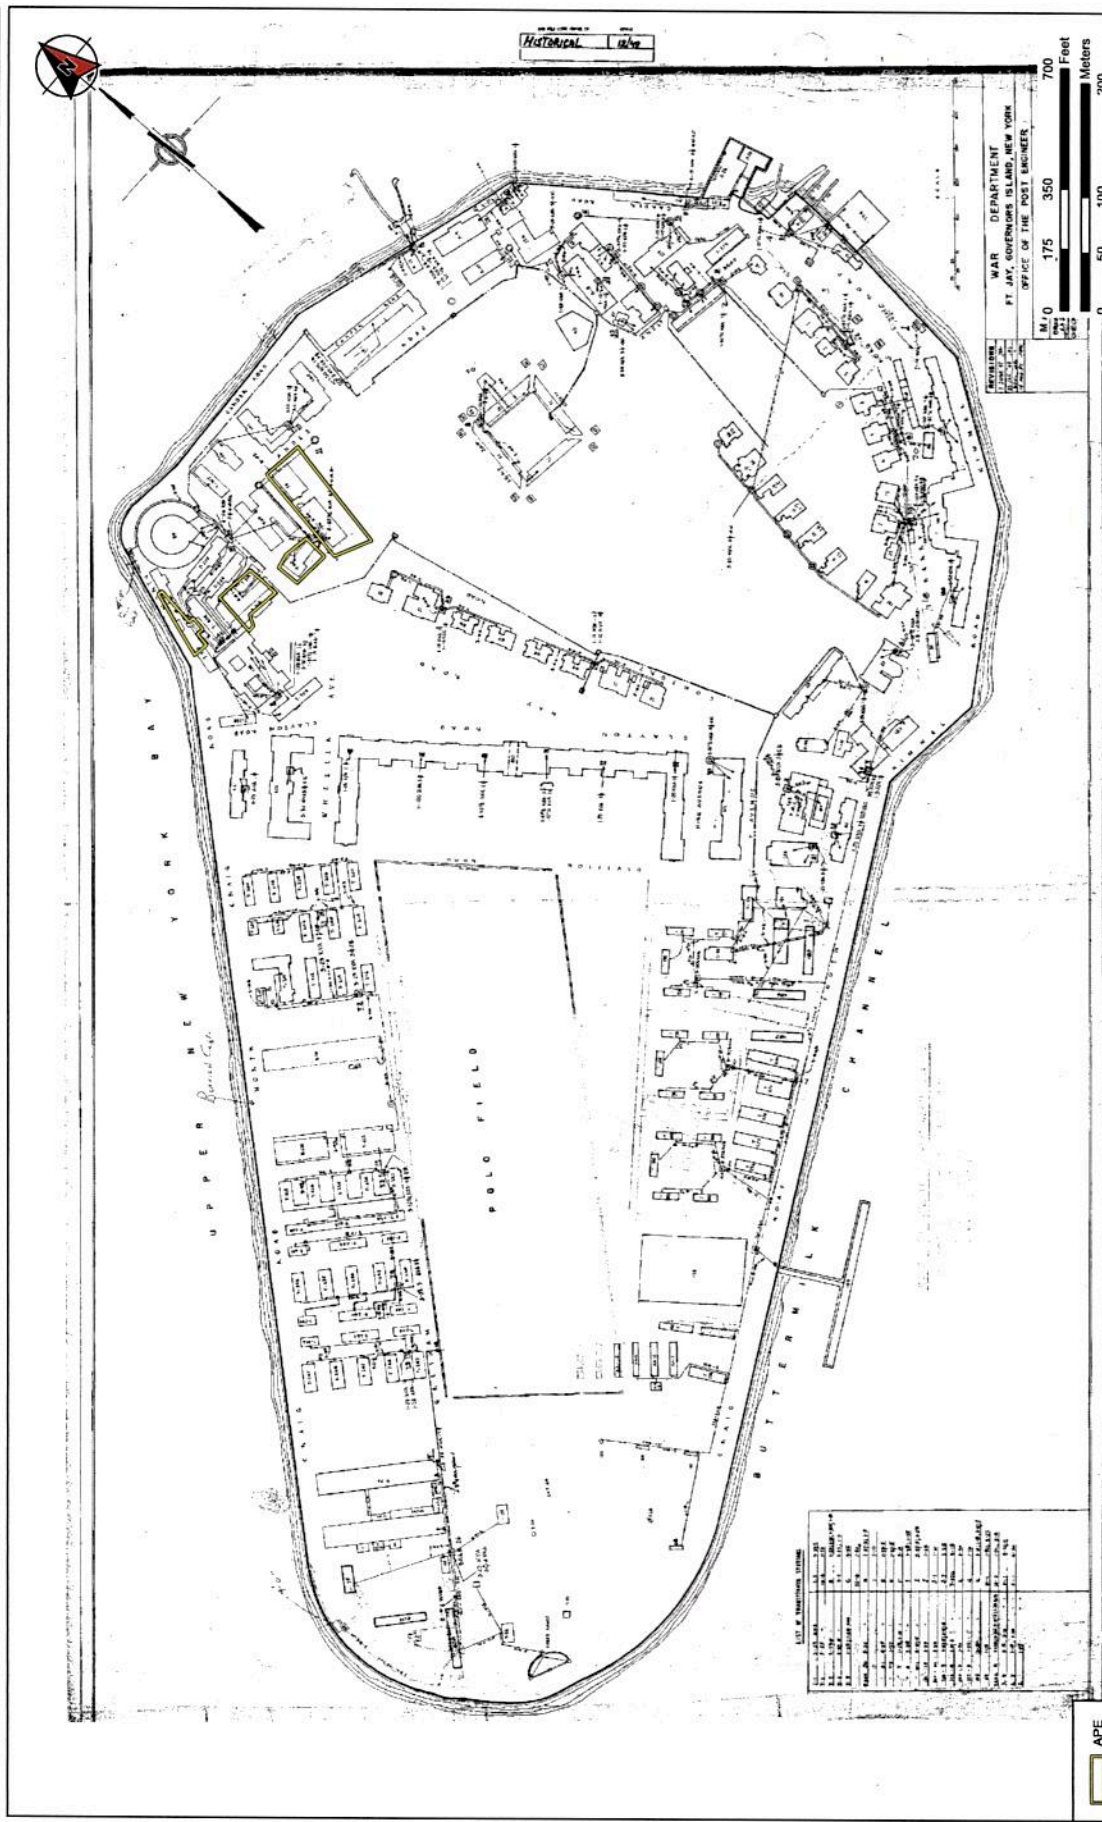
Plan of Facility Layout of Governors Island in 1948. Note some of the structures depicted in 1906 are still present, with new ones added in general vicinity of APE. Also shows that proposed layout of structures on 1930 map were not adopted. (U.S. Coast Guard 1948)
